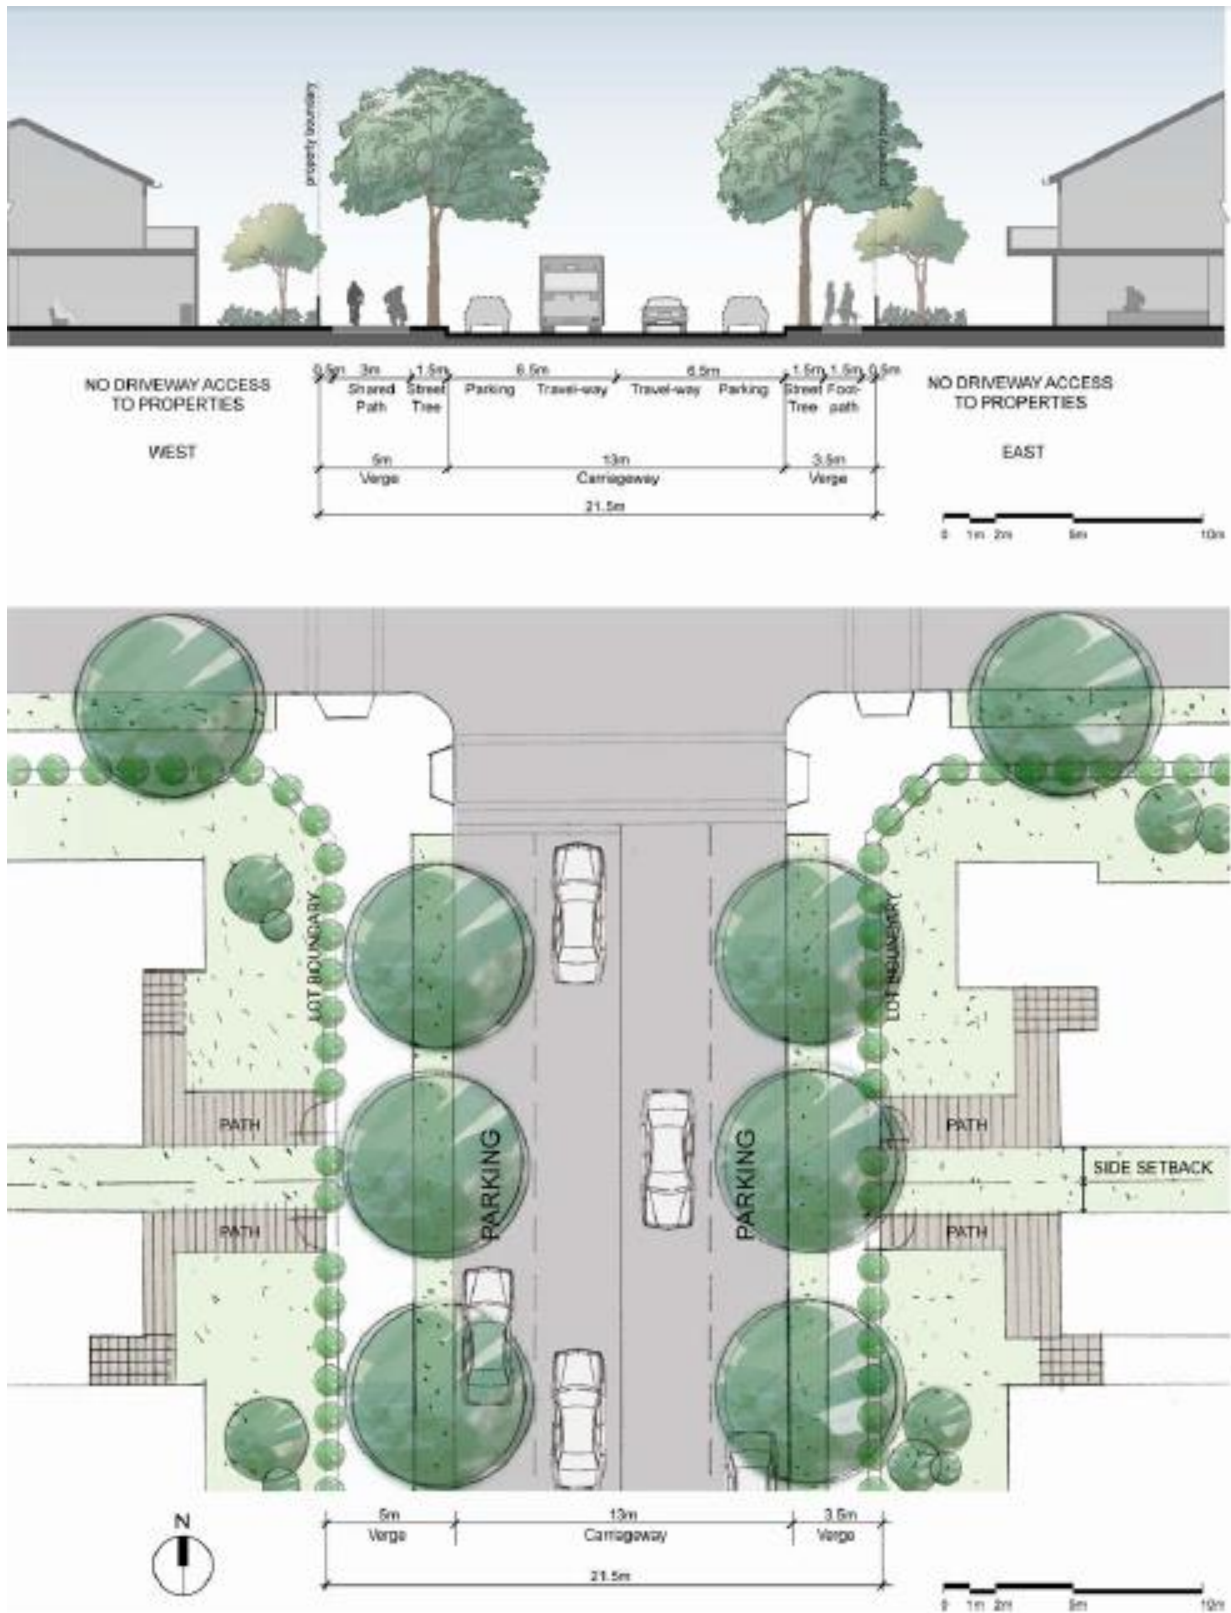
Sub Arterial Road A - Hezlett Road (South of the Town Centre)
